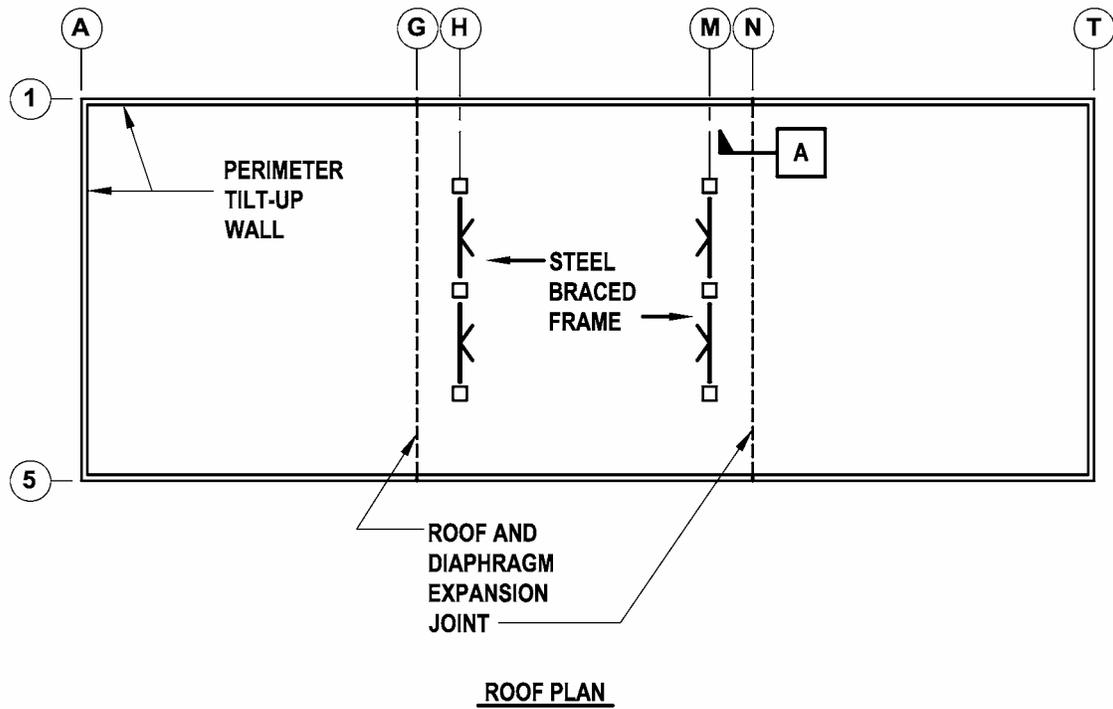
Plan and Detail of Large PC1 Building Constructed in Three Sections
